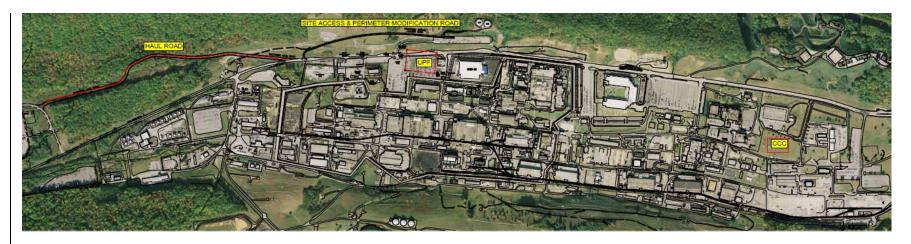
Proposed Haul Road and Site Access and Perimeter Modification Road.
